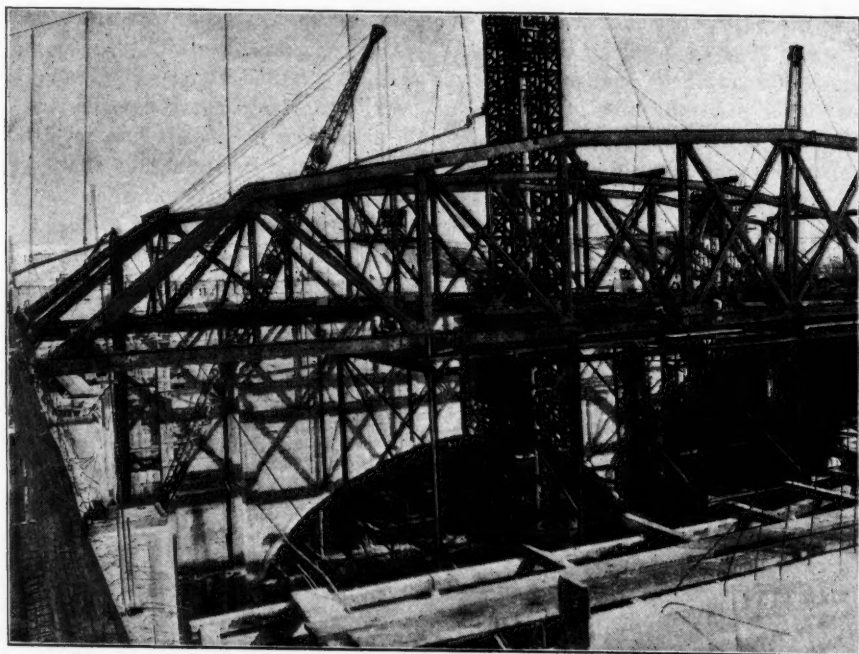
ROOF TRUSSES, ROLLER END SHOWING MOVABLE STEEL FALSEWORK, AL MALAIKAH TEMPLE.
